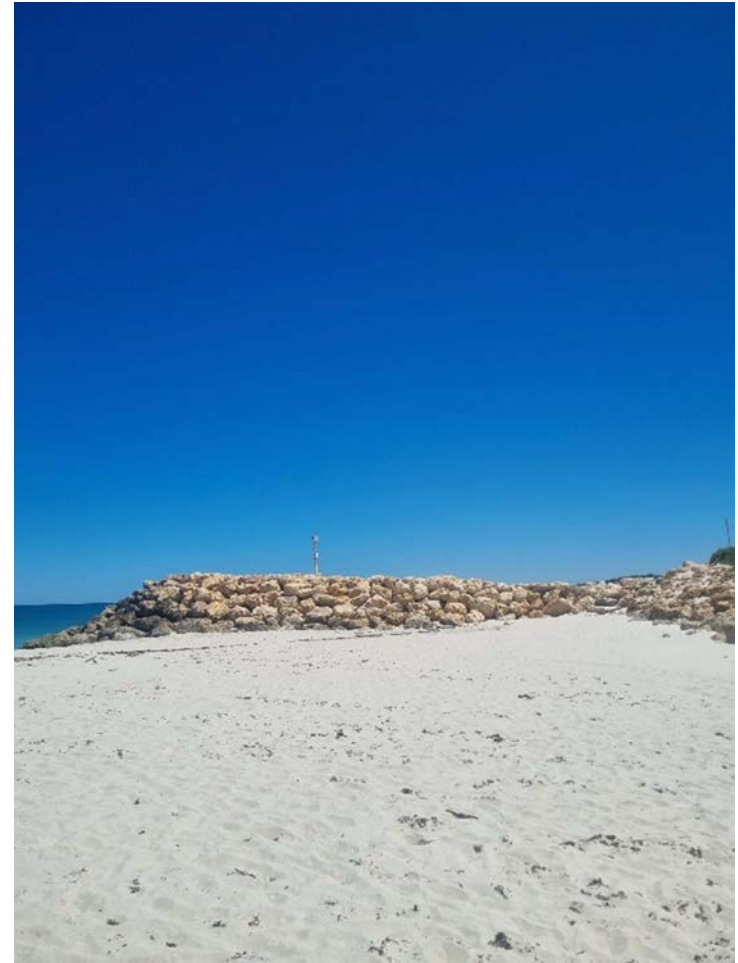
Photo taken north from access stairs, north end of section 2. Groyne 1 shown with ~50m beach width (taken 11 December 2023)
